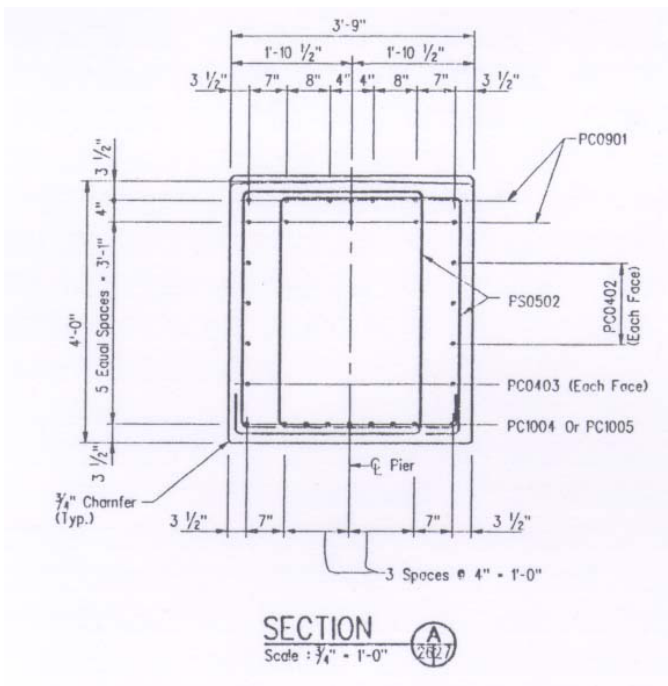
The actual cross section of the East Bound bridge pier cap beam [Brown, 1993].
